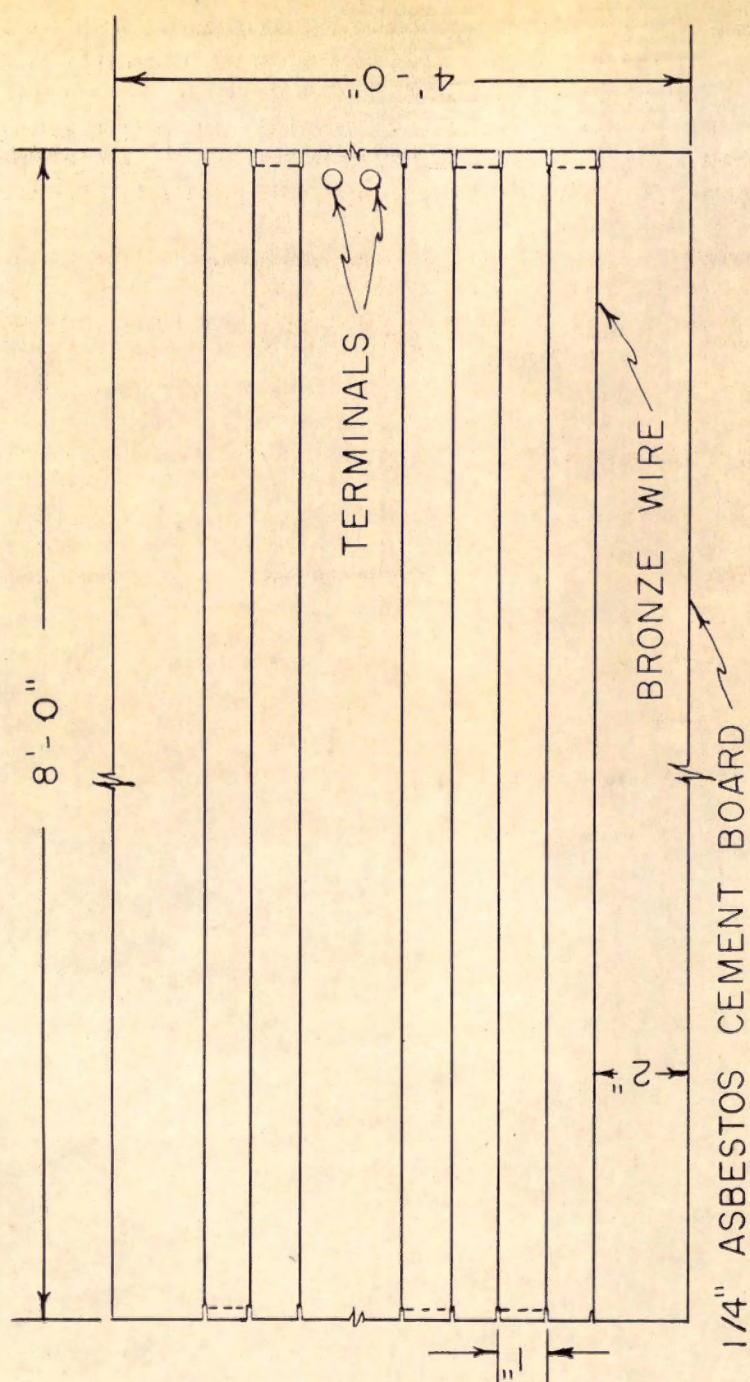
PLAN VIEW OF BRONZE WIRE PANEL
